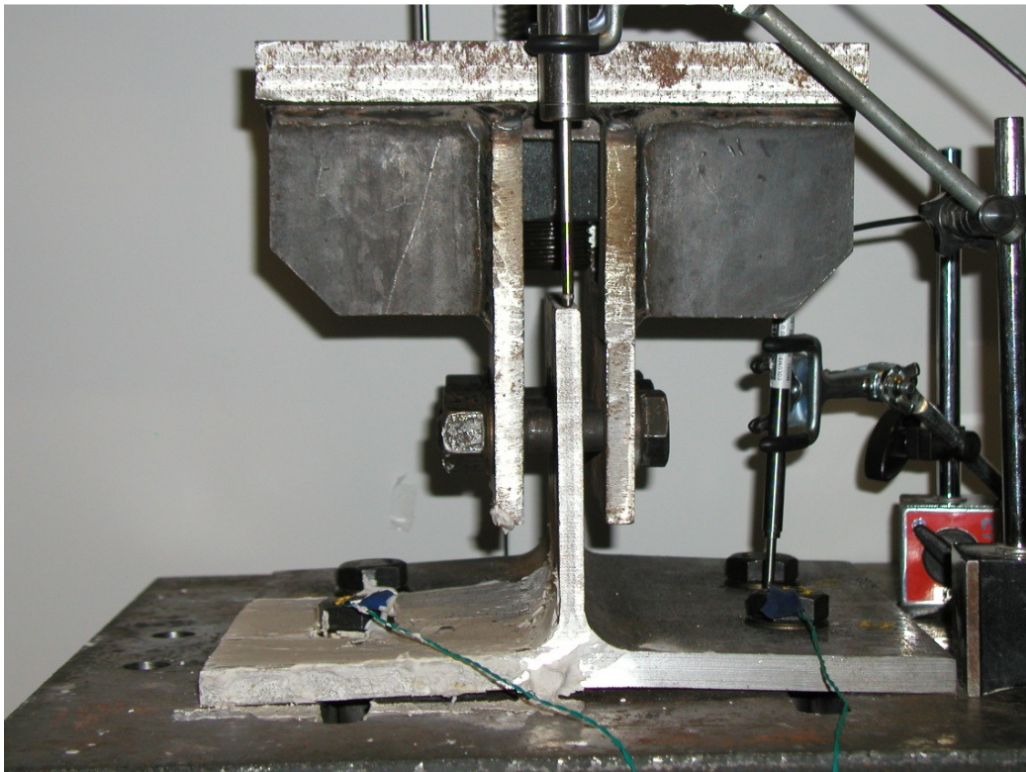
Deformed Shape for Specimen 1.5b at 100 kips Applied Load.
